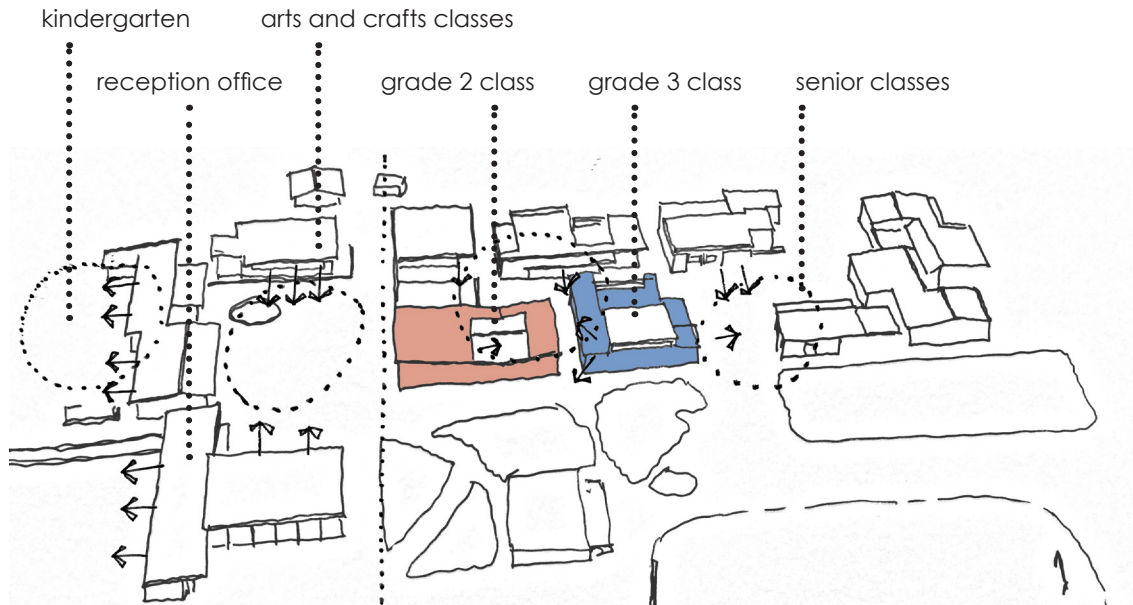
Site plan of Mzamba School showing the surveillance and central spaces between the classes.
